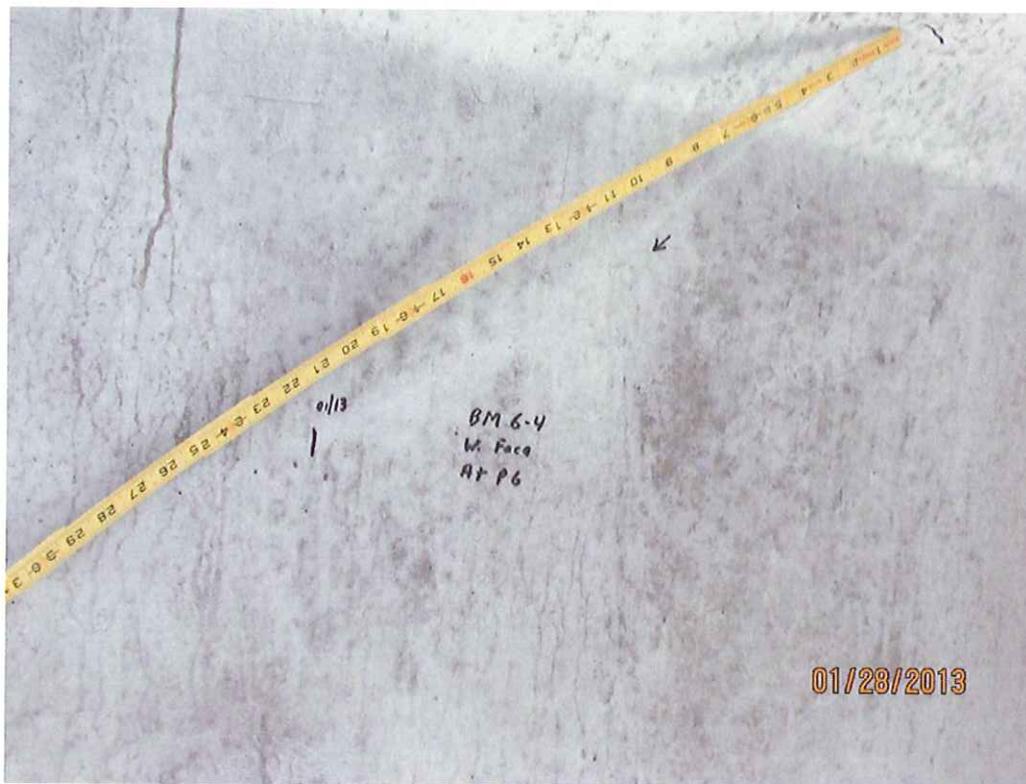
Typical diagonal crack in beam web extending down and away from top flange
